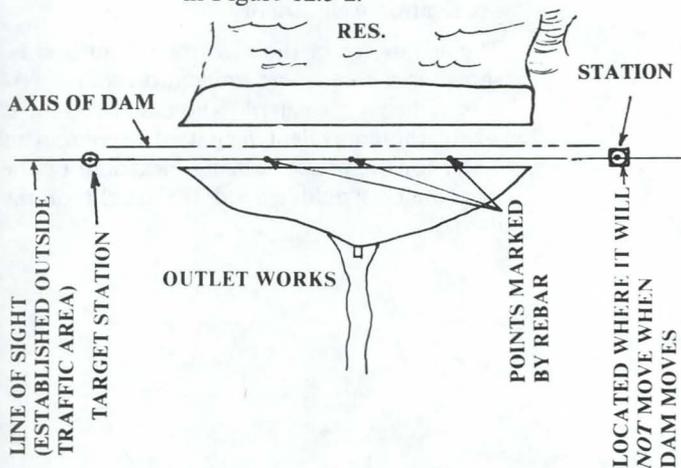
PLAN OF ALIGNMENT SYSTEM
